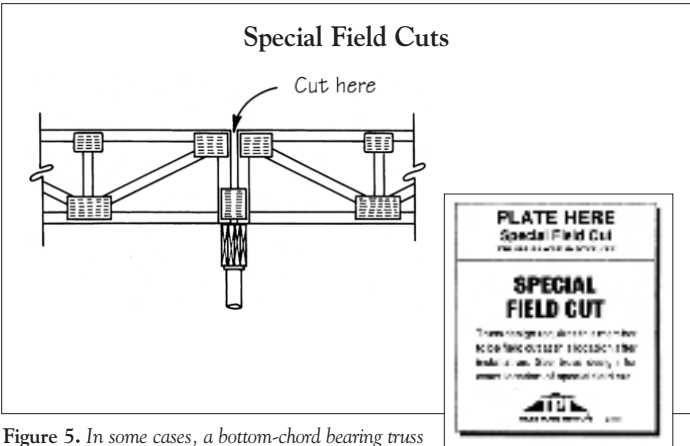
In some cases, a bottom-chord bearing truss that crosses a girder or bearing wall may be engineered as two simple beams. The tag will instruct the builder to cut through the top chord after installation so that the truss does not see-saw across the girder (inset).
